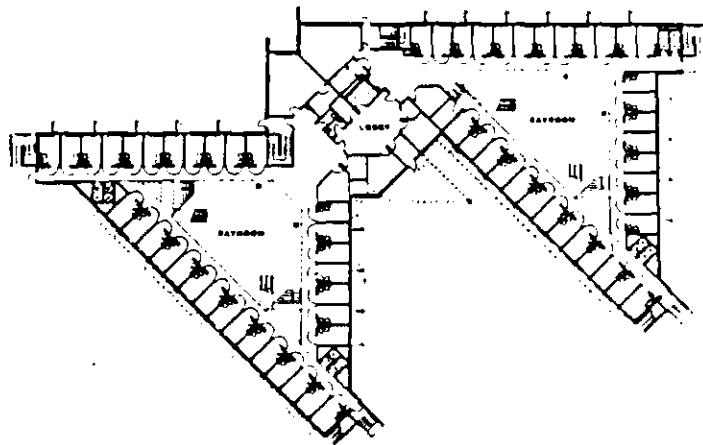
8: A Typical Floor Plan of Direct Supervision Units in a Pod
